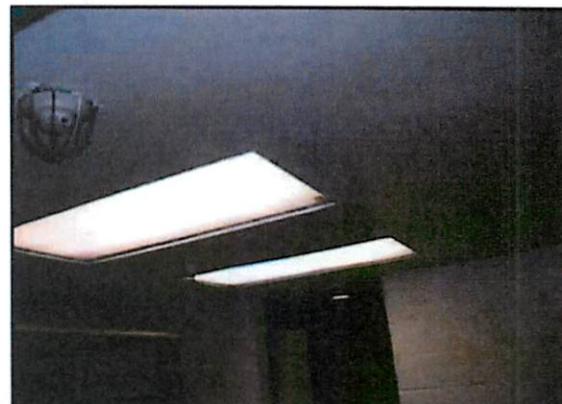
South wing restroom ceiling, no exhaust ventilation observed
